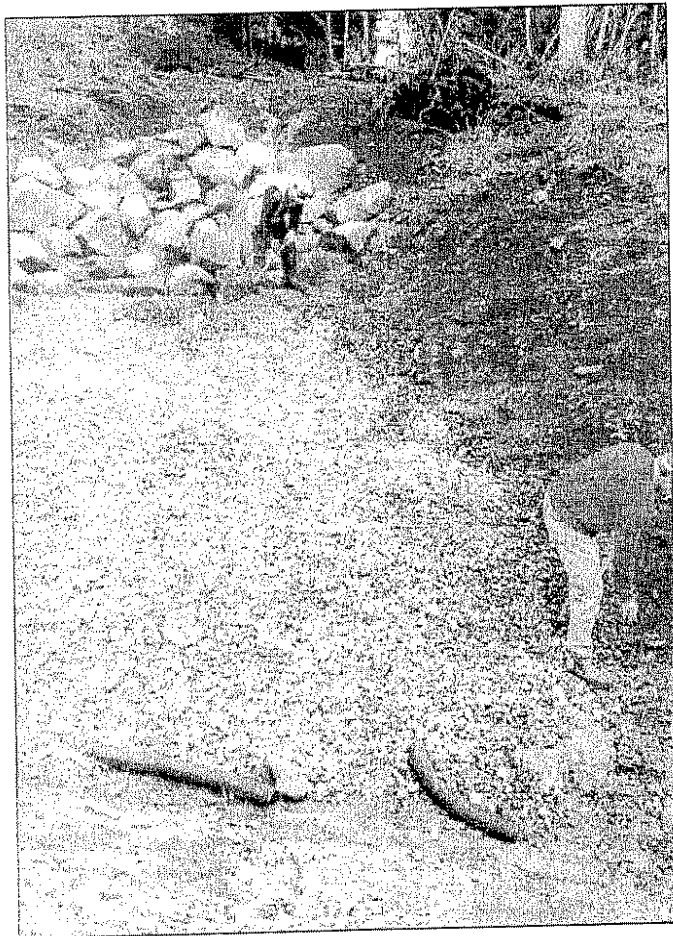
The small landslide (roadside batter collapse) at complaint site 2 has been successfully stabilised by installing drainage and armouring the backwall of the collapse with boulders.
